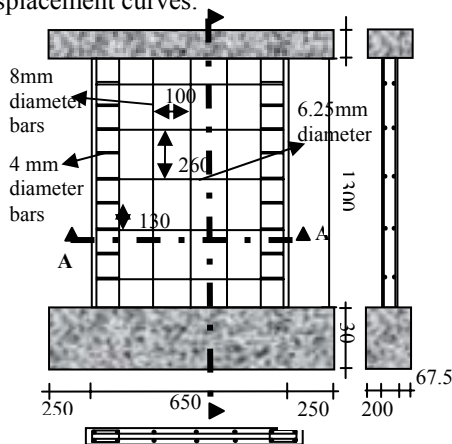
Arrangement of the reinforcement for the RC walls tested (dimensions in mm).
